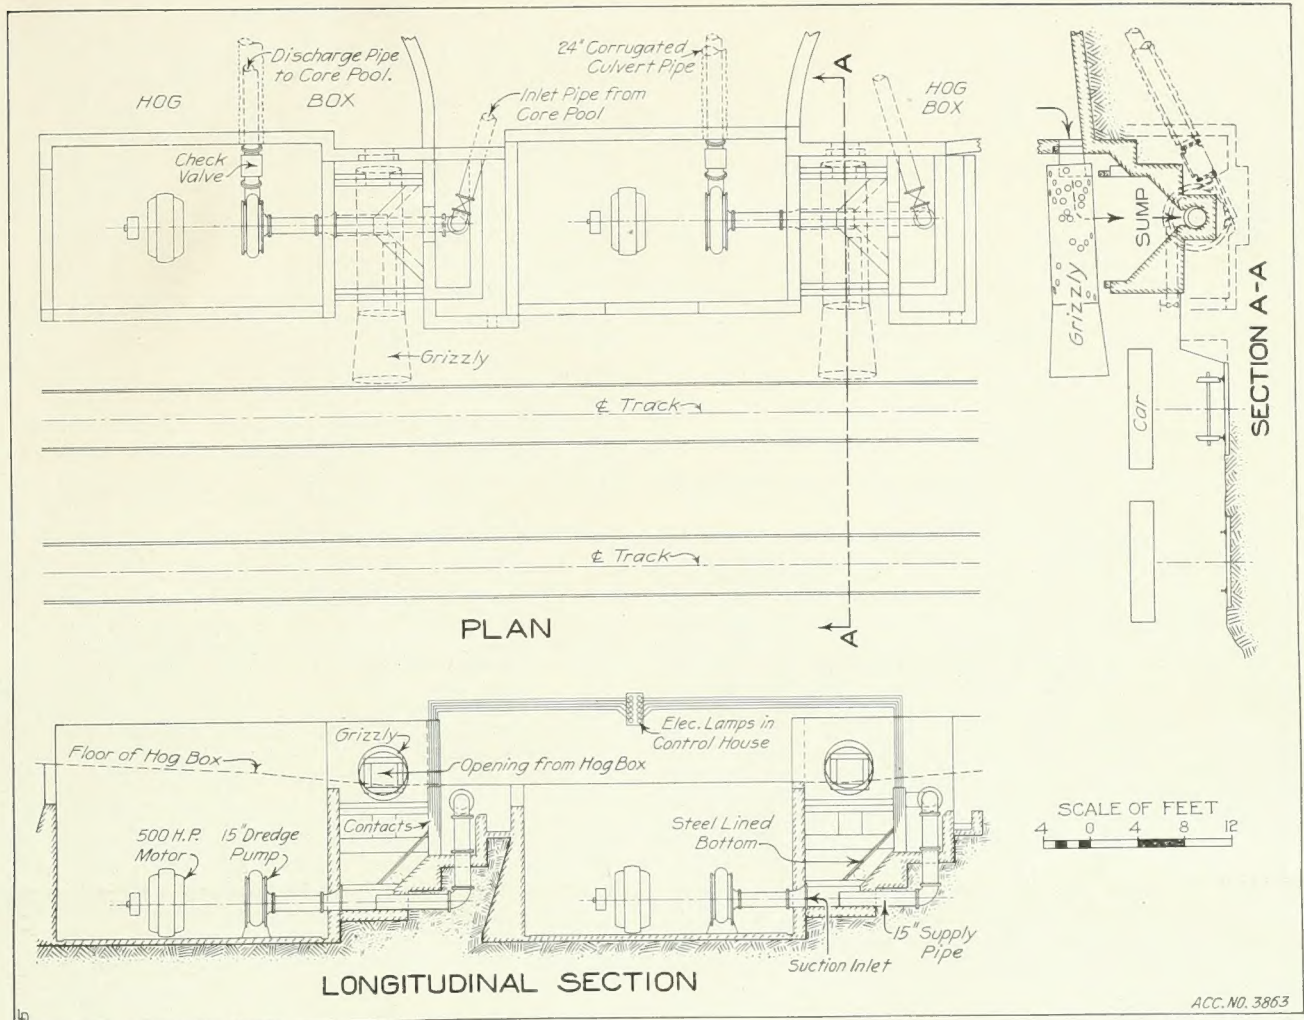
IMPROVED DREDGE PUMP LAYOUT AT ENGLEWOOD DAM.
